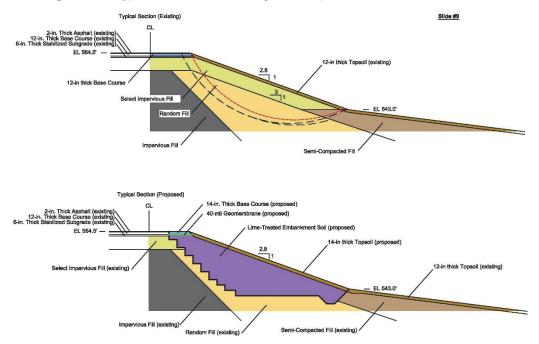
Typical Section of Existing and Proposed Conditions for Slide #9
